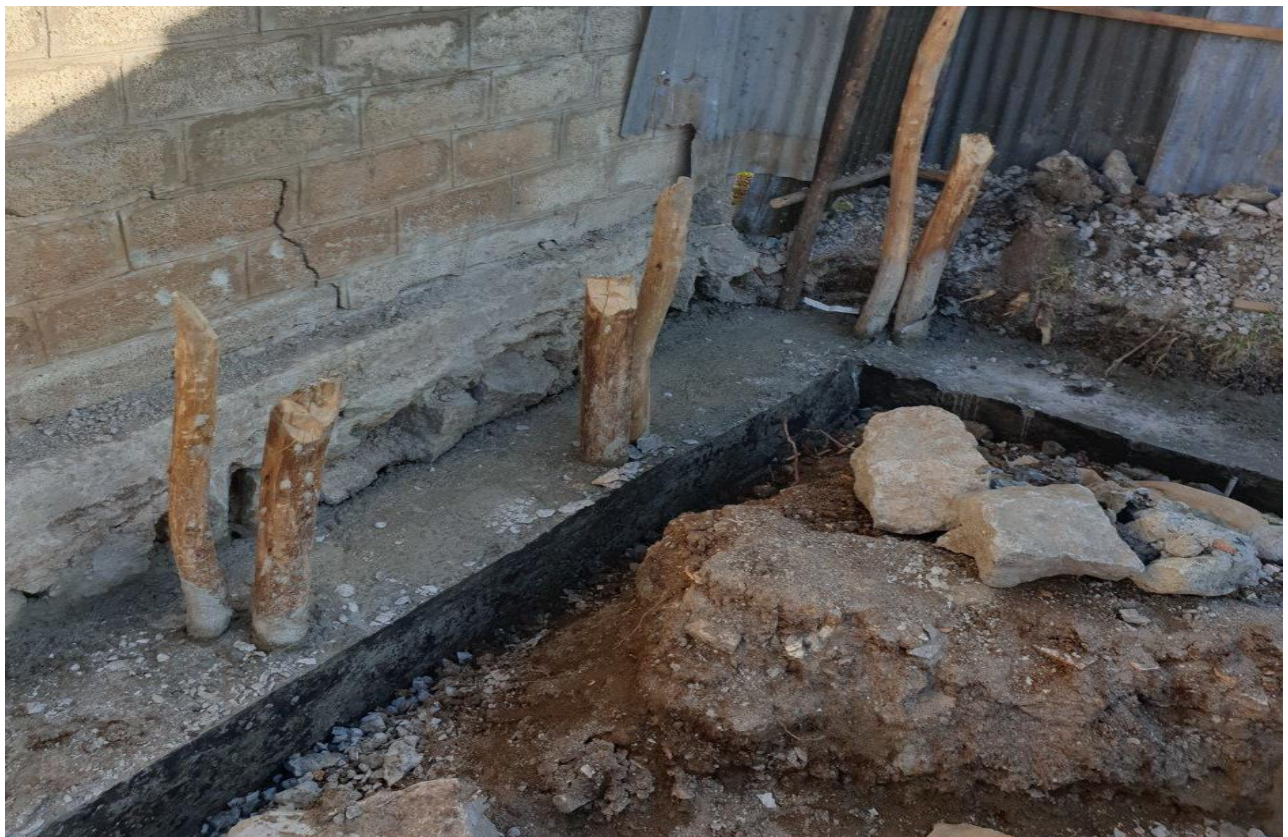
BRACING BEAM CONCRETE CASTING
